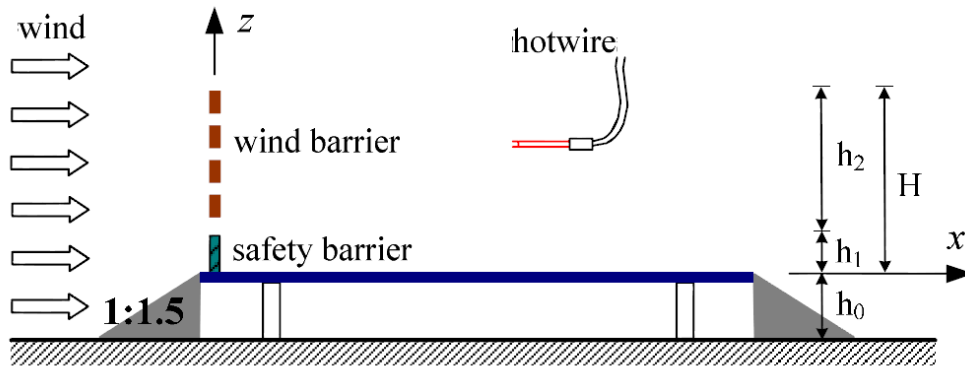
Schematic diagram of wind barrier arrangements for an elevated bridge and embankment
